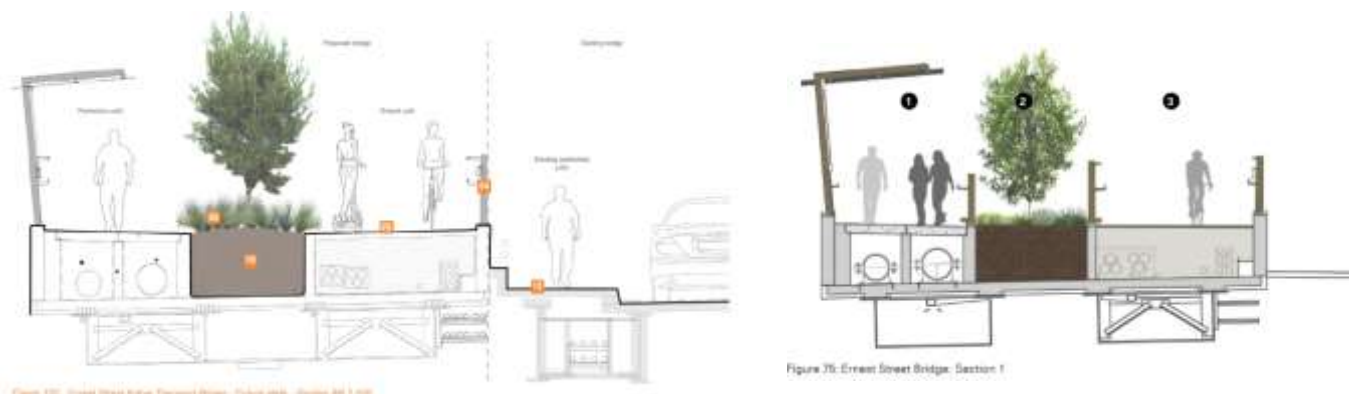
Cross sections of the Ernest Street active transport bridge from the PDLP for the WFU (Left) and the WHT (right) (Source: TfNSW)
